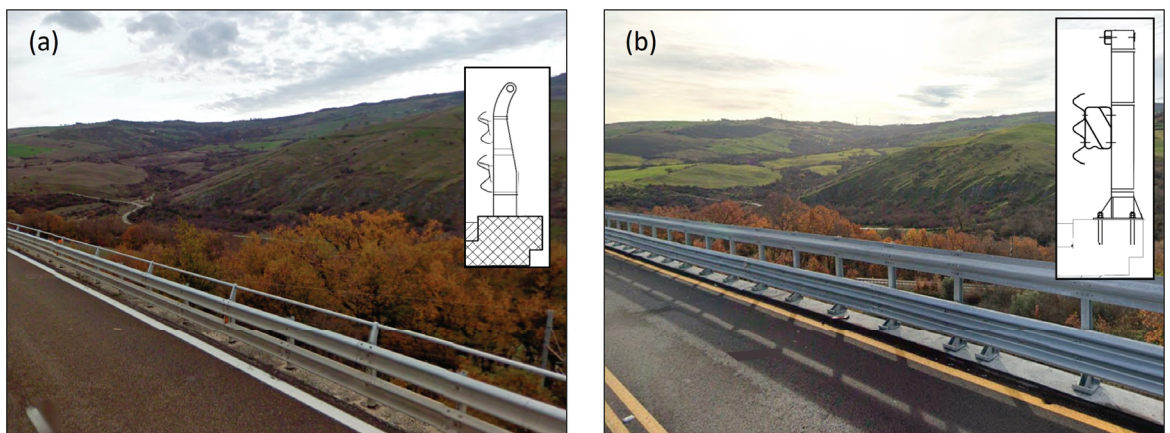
Photo and scheme of pre- (a) and post- (b) railing refurbishment intervention on a reinforced concrete bridge.
